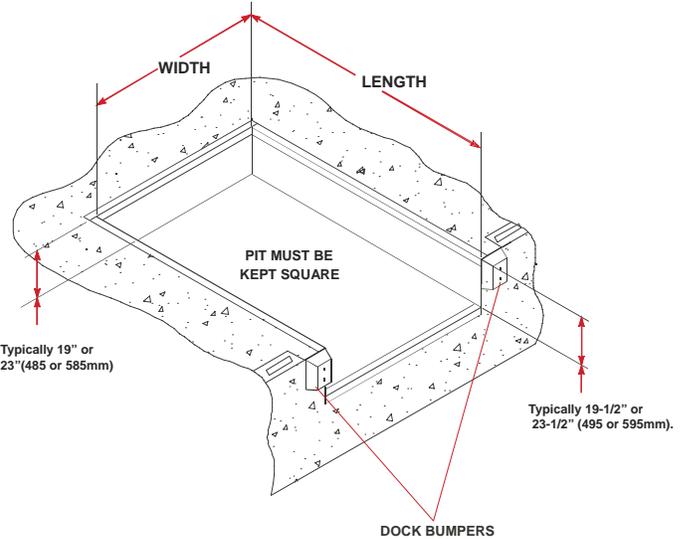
Pit Layout - Typical (Four piece curb angle shown)
